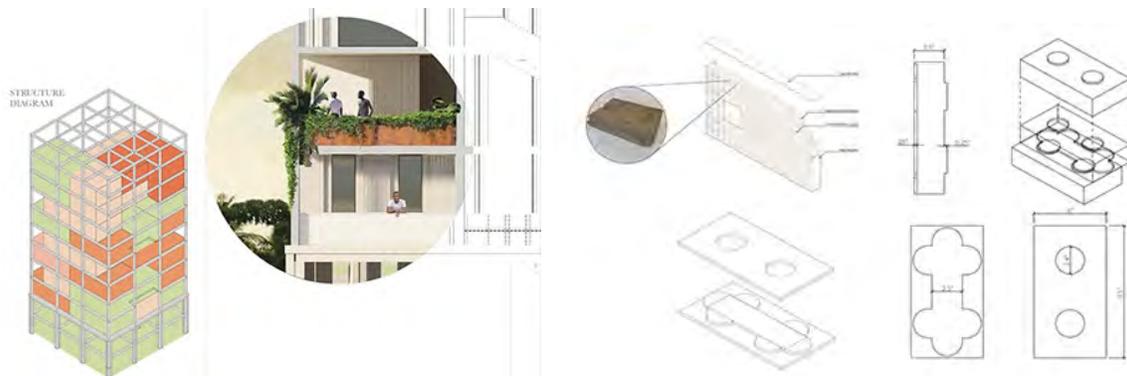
Frame and load bearing wall structural systems. Source: (Author 2020)
